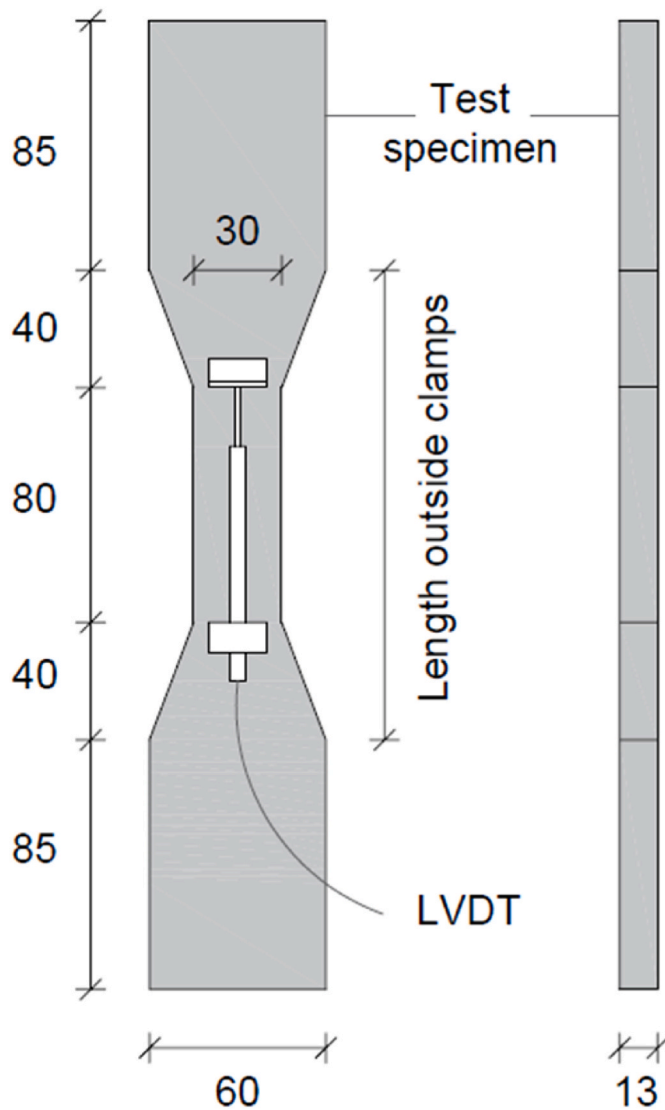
SHCC dumbbell specimen (dimensions in mm).
